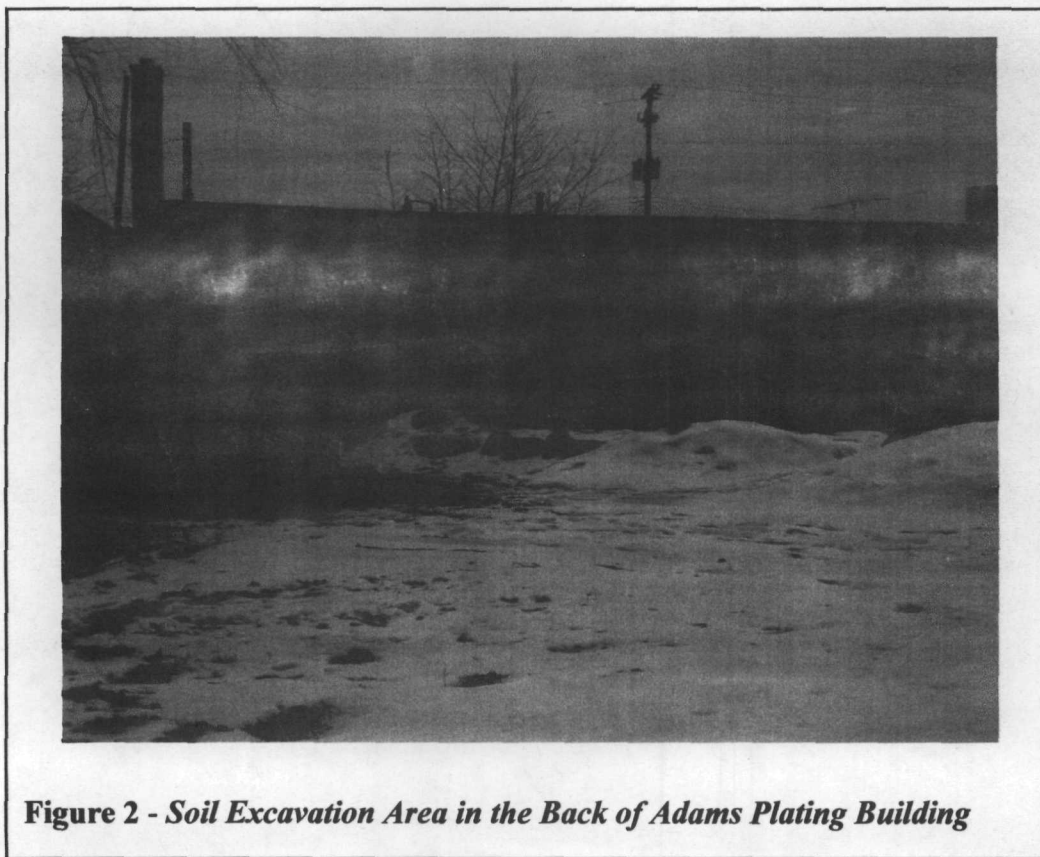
Soil Excavation Area in the Back of Adams Plating Building
